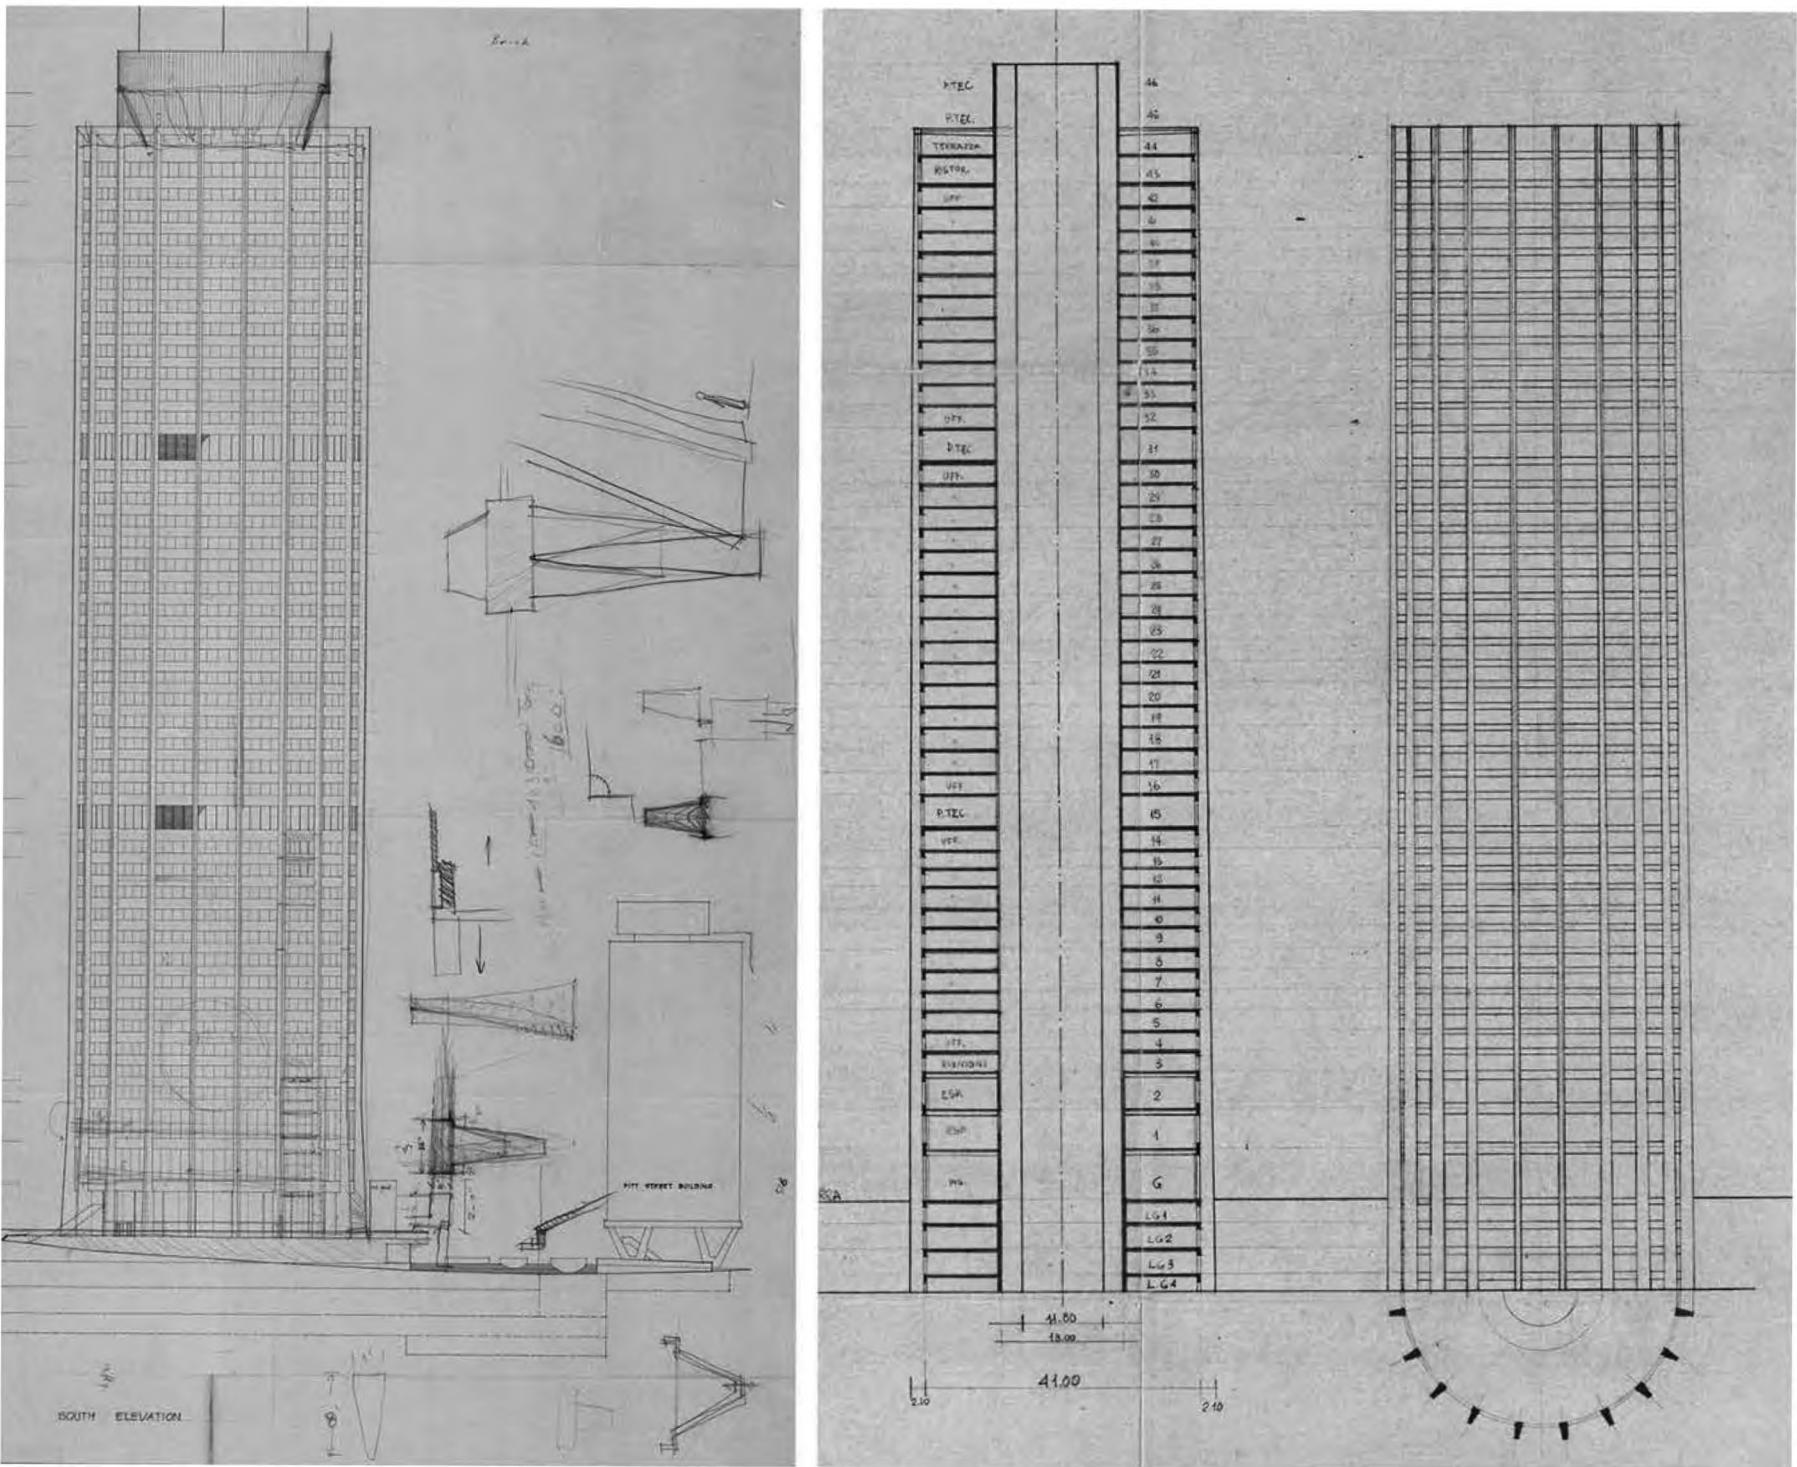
Left: T64 - South Elevation, HAS, Series 59:10 (detail), Sydney, 1963. (MAXXI Architettura Collection. Pier Luigi Nervi Archive, Rome.) Right: SK.4 – Structural Section and Elevation (detail), Studio Nervi, Rome, 1963. (Author Archive.)
